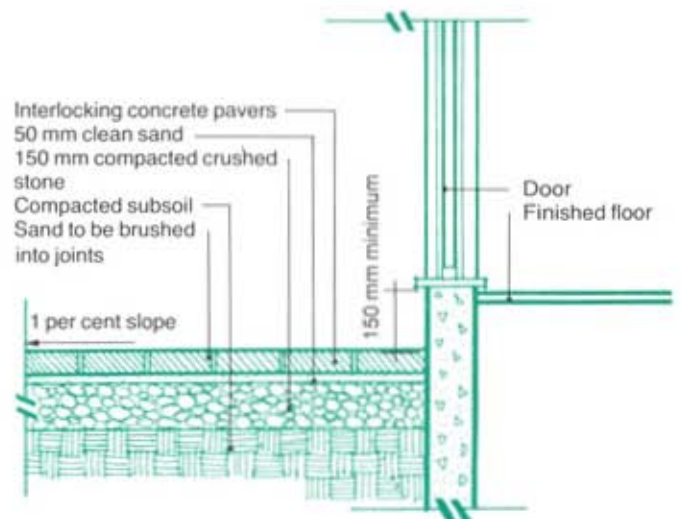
A typical section view through interlocking concrete paving used as a patio surface.
